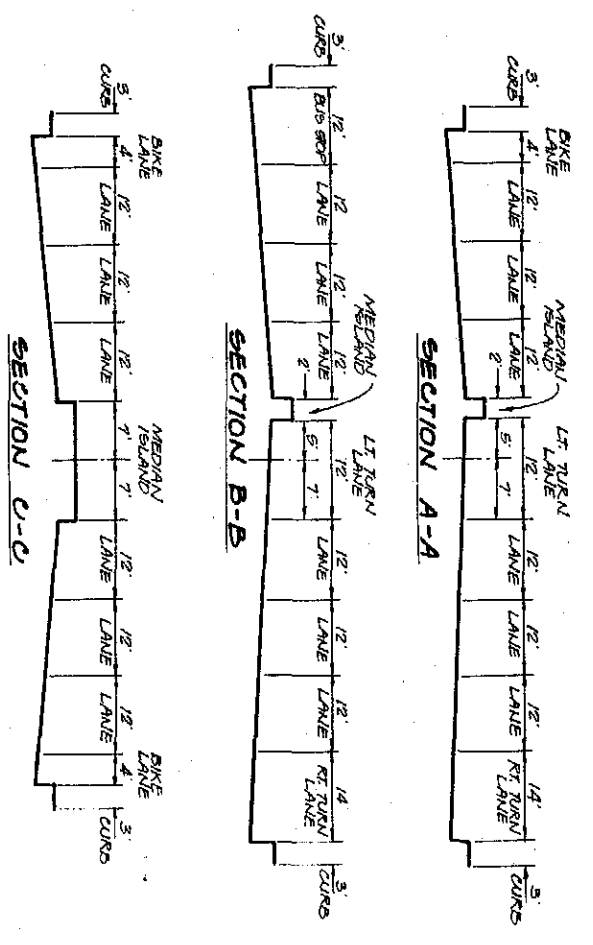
" SOUTHEAST ROSEVILLE SPECIFIC PLAN
